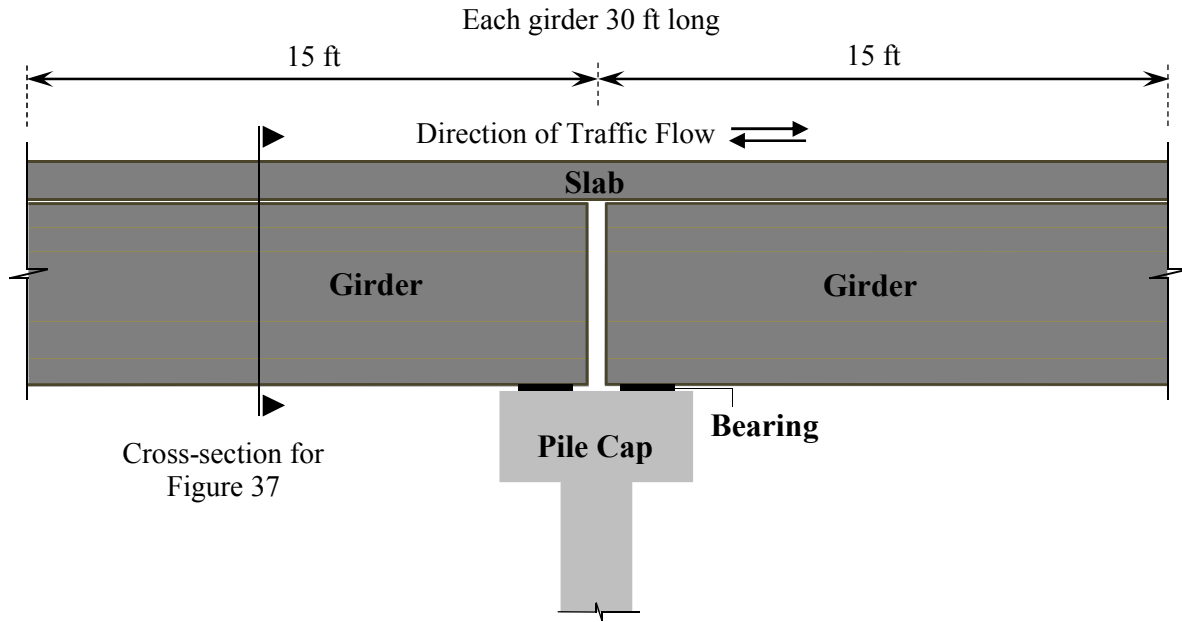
Schematic of a 30-ft section of the bridge superstructure
